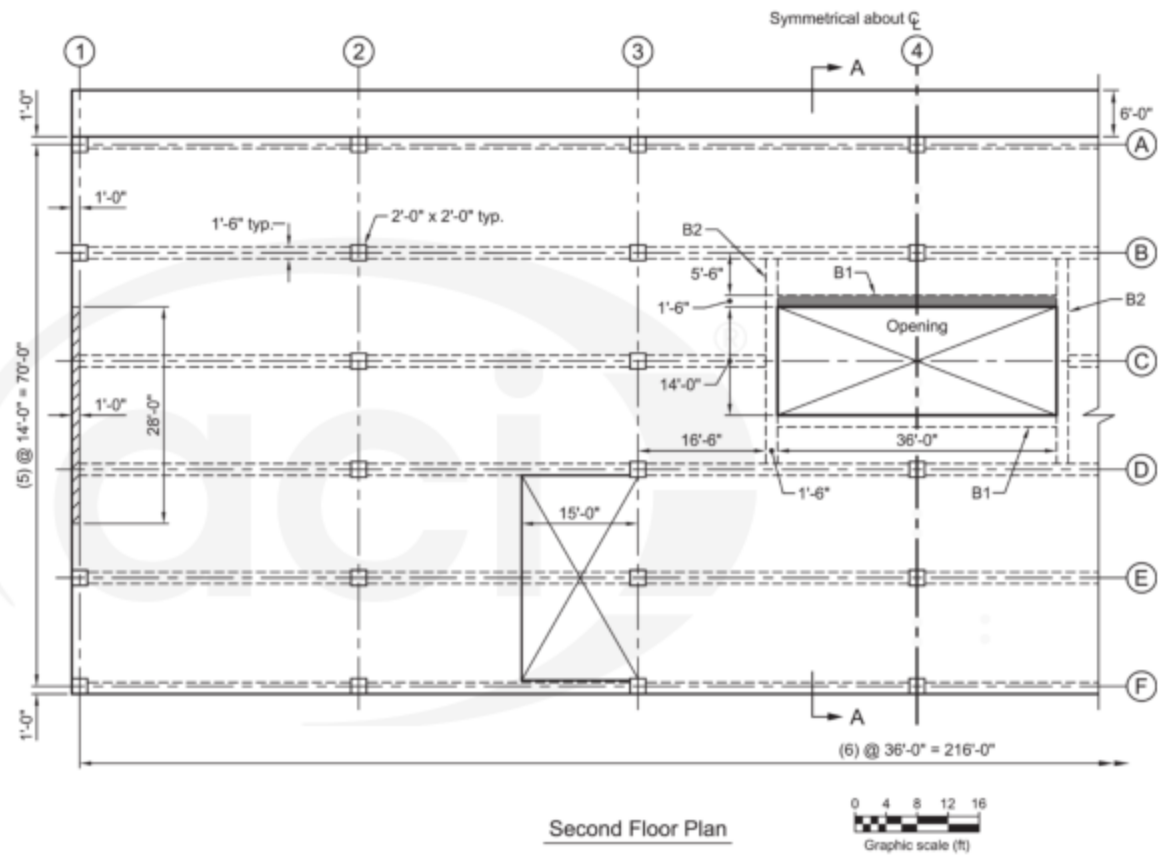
Framing plan showing slab opening and beams framing slab opening.
